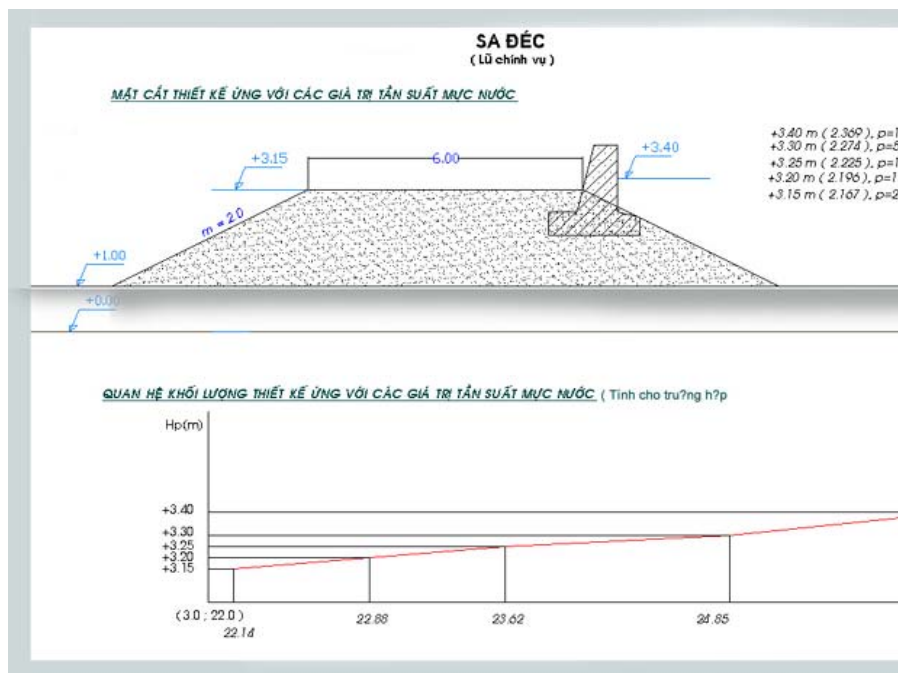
Typical cross-section of embankment for Sa Dec Town
